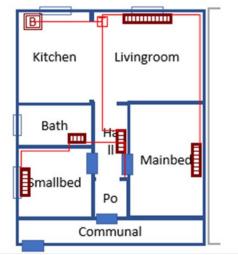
Floor plan – Pre 1919 two-bedroom flat
